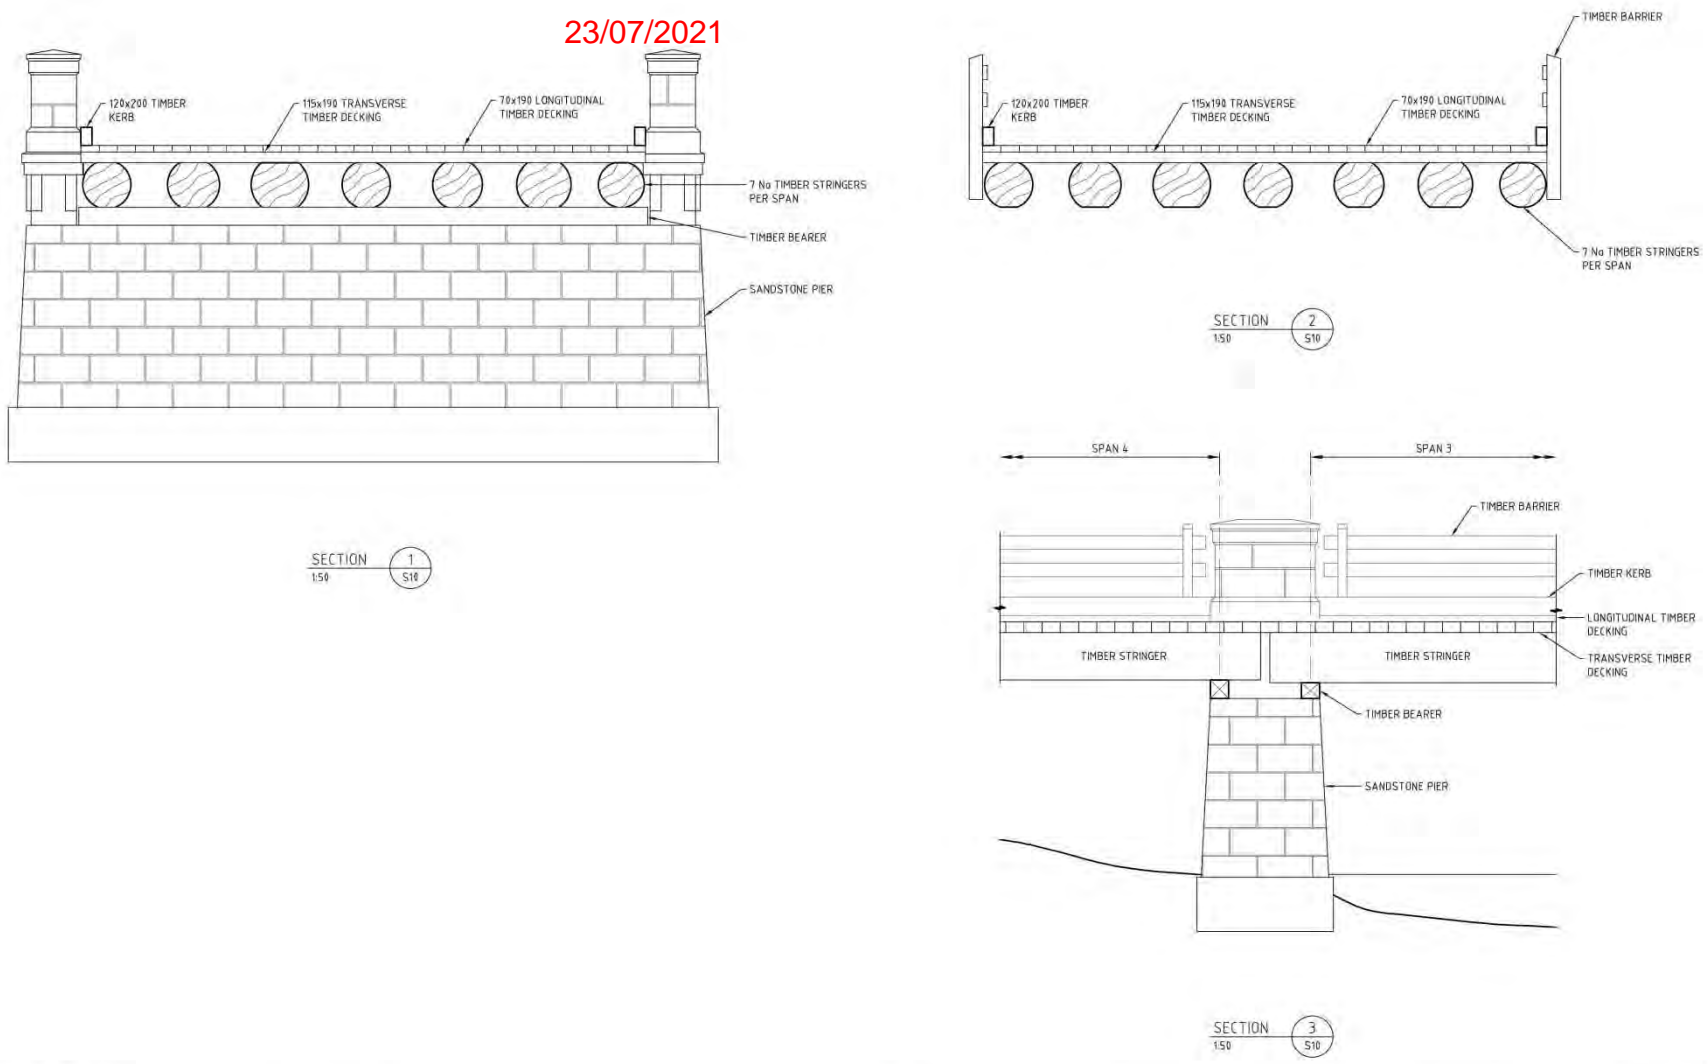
Schematic layout of the existing bridge, Pitt & Sherry, 2012
